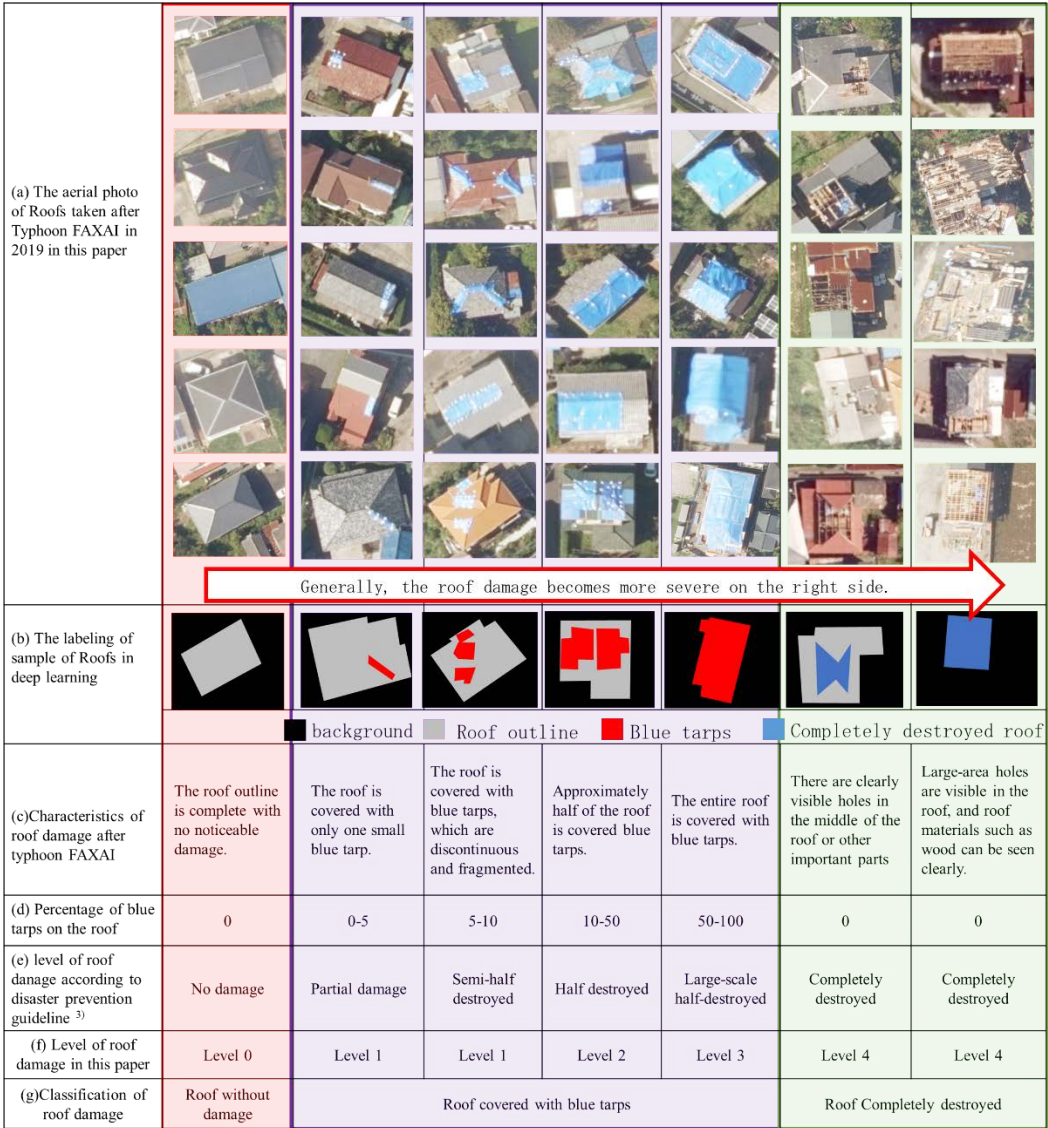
Appearance and level of roof damaged in Typhoon Faxai in 2019.
